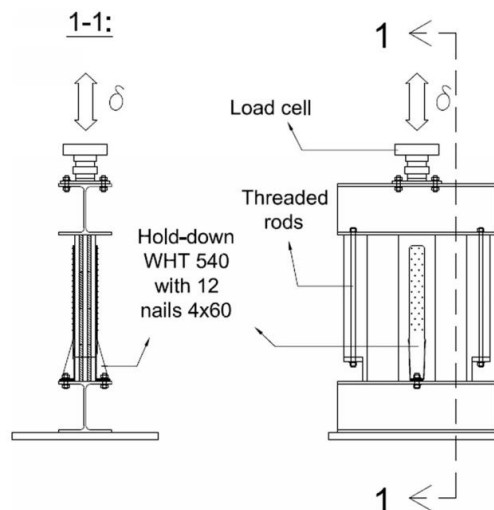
Elevation (right) and cross-section (left) of test setup used for wall-foundation hold-down connection loaded in tension (Test configuration #1) [35].
